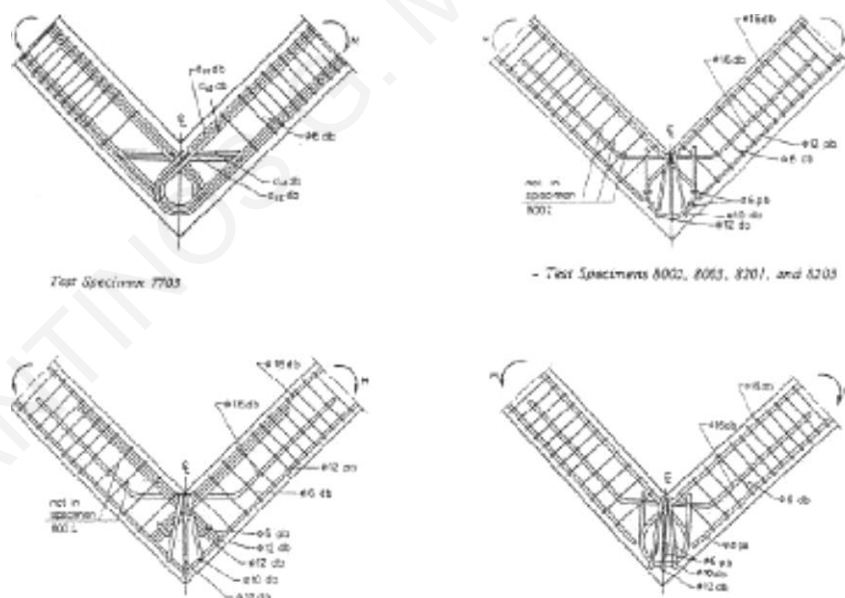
Characteristic example of reinforcement detailing in “old-type” elements. (fib Bulletin No. 24 2003)
